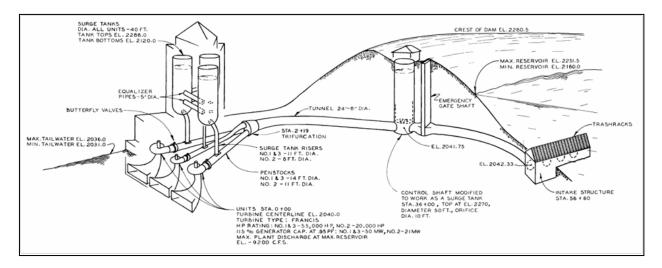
Schematic drawing of the outlet works at Fort Peck Dam.
